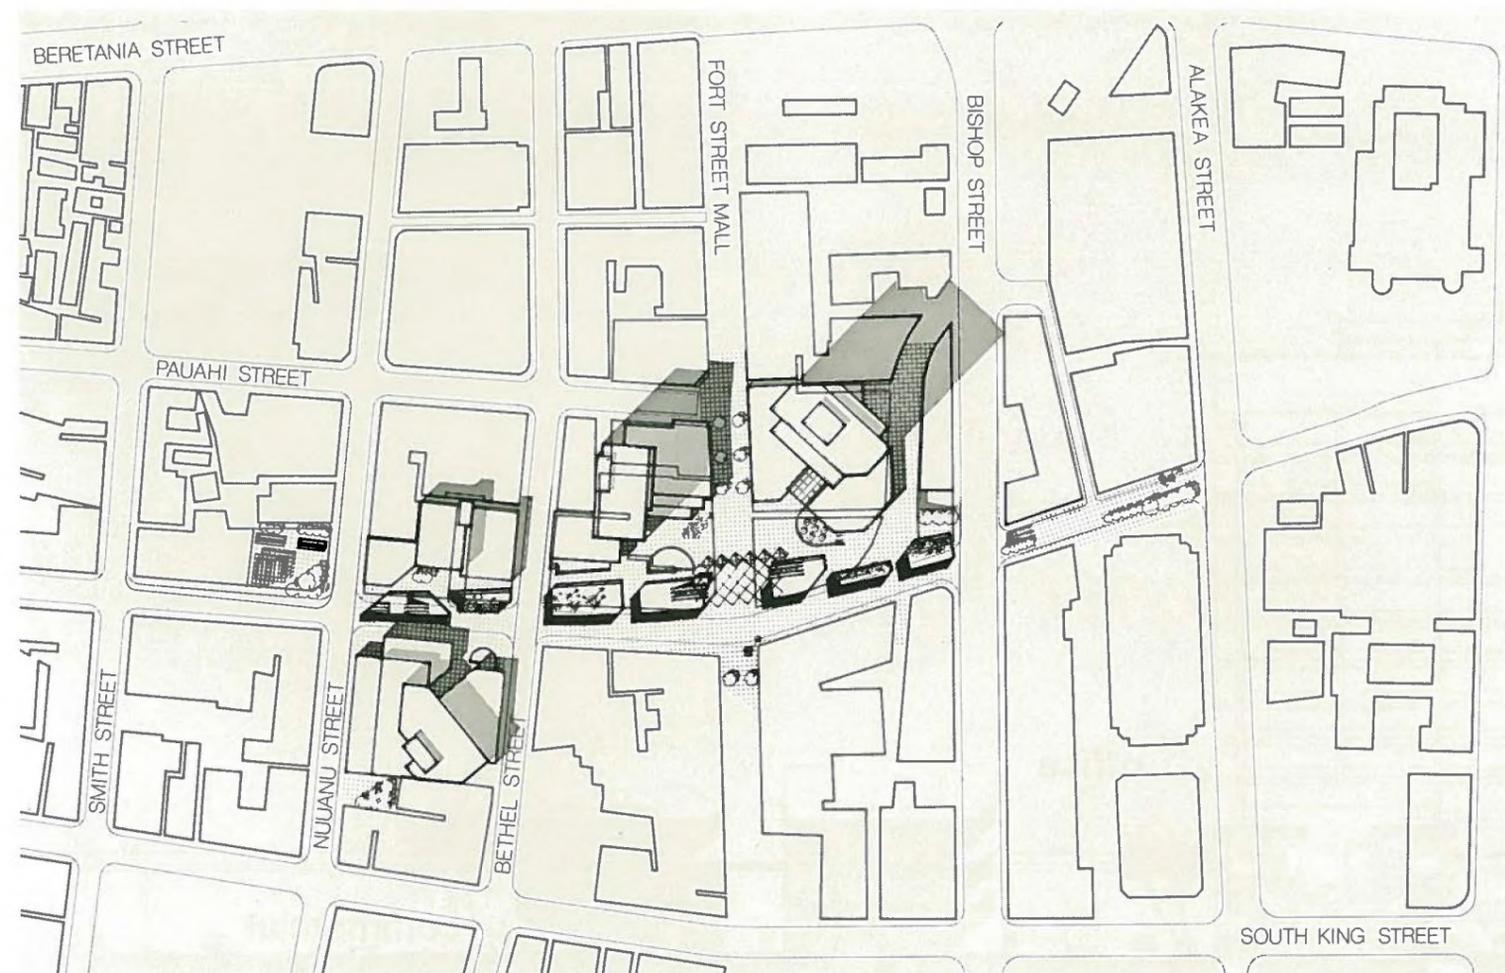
Fort Street Urban Design Concept Site Plan
